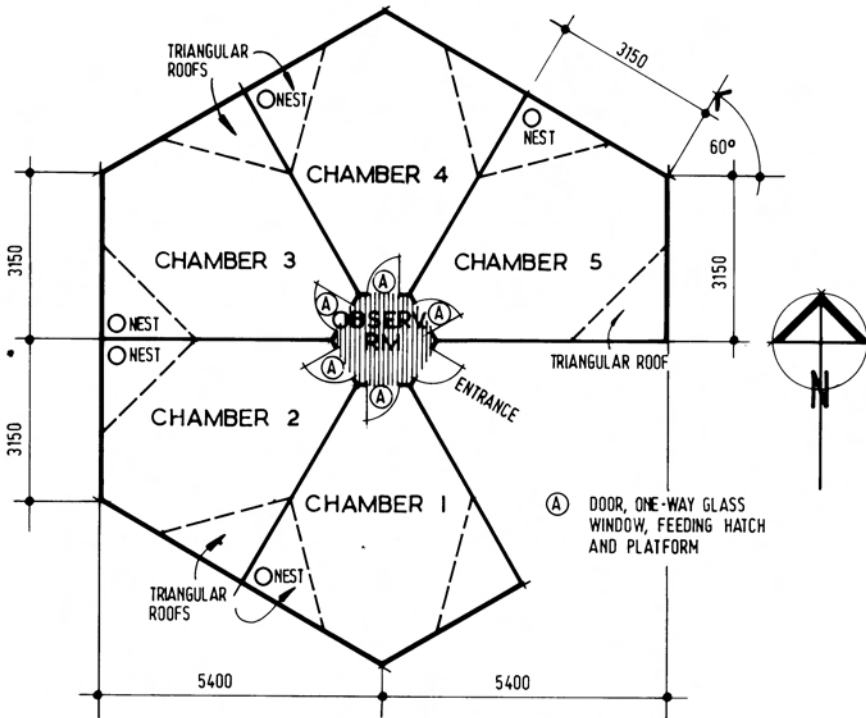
Plan of Second Breeding Unit. Scale 1:100
